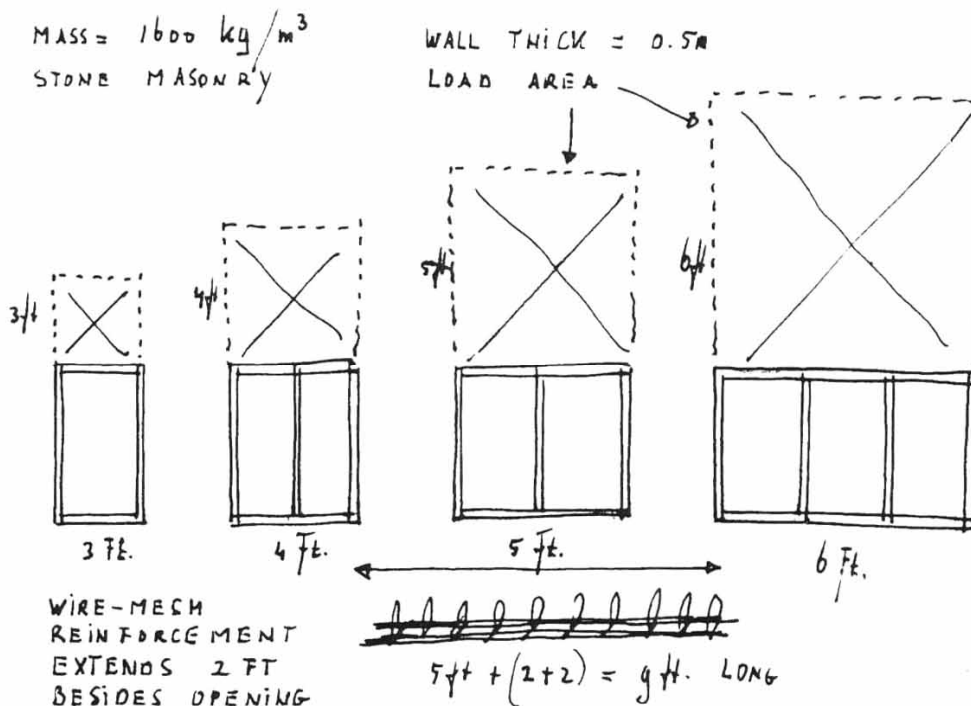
BASIS OF THE LINTEL BEAM CALCULATION FOR A STONE WALL
